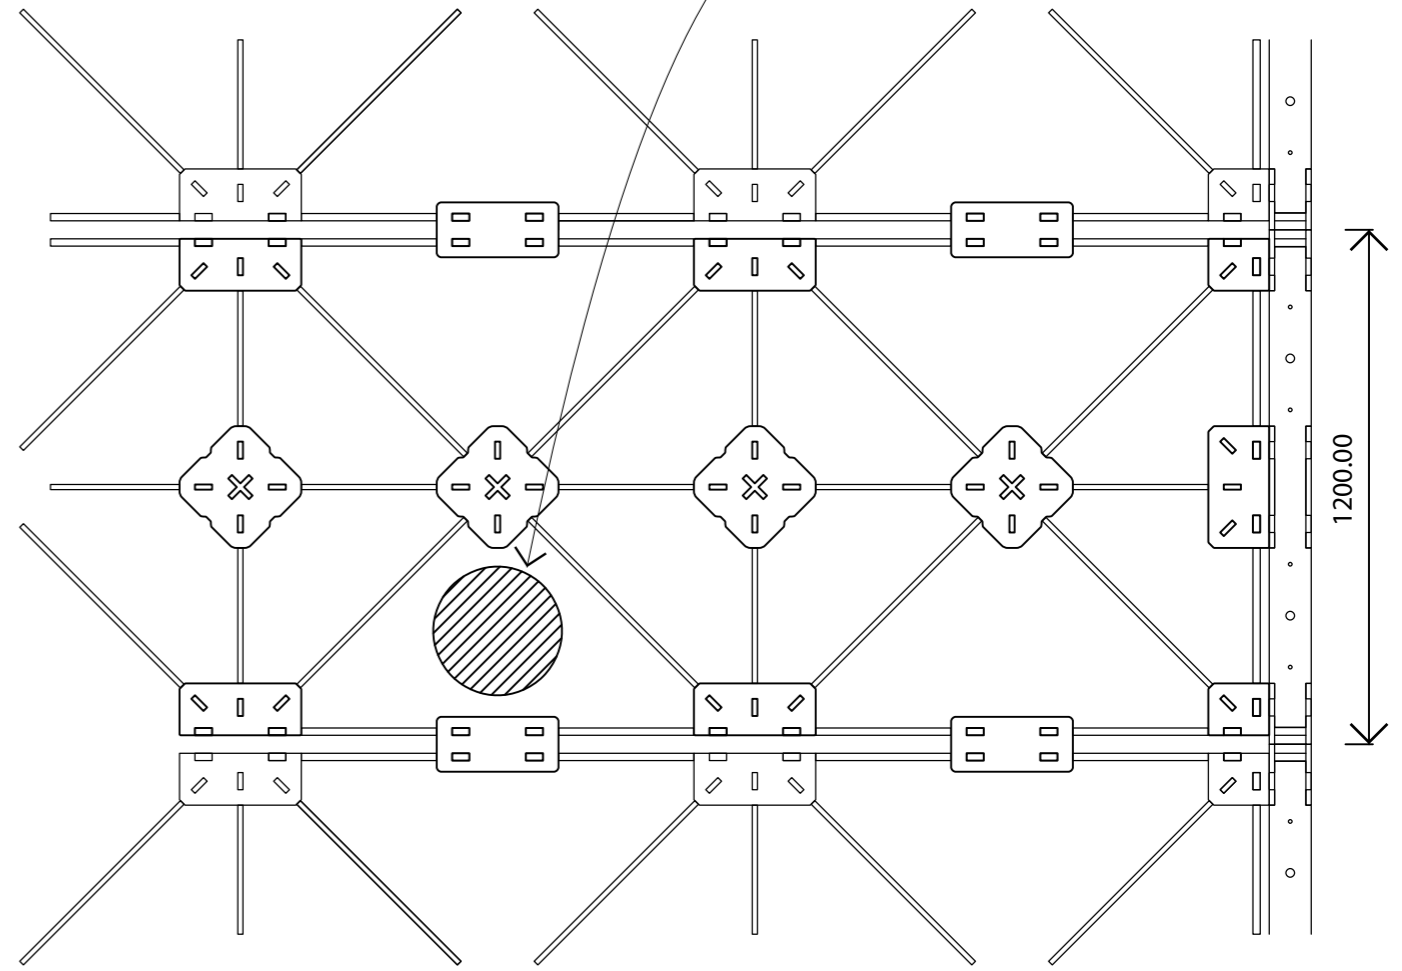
m x 2.4m Standard Panel with Roof Connection
